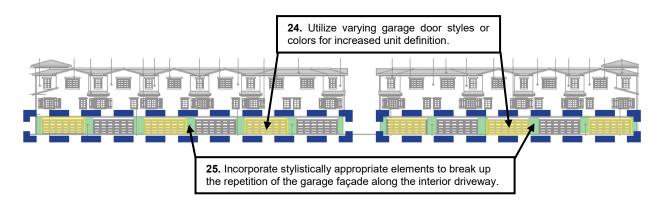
RRM Design Group (Marked-up Site Plan)
